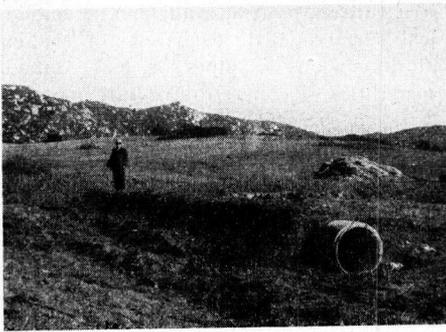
Rigid Culvert Placed on Embankment Subgrade and Covered with Mound of Earth. Poor Practice.
